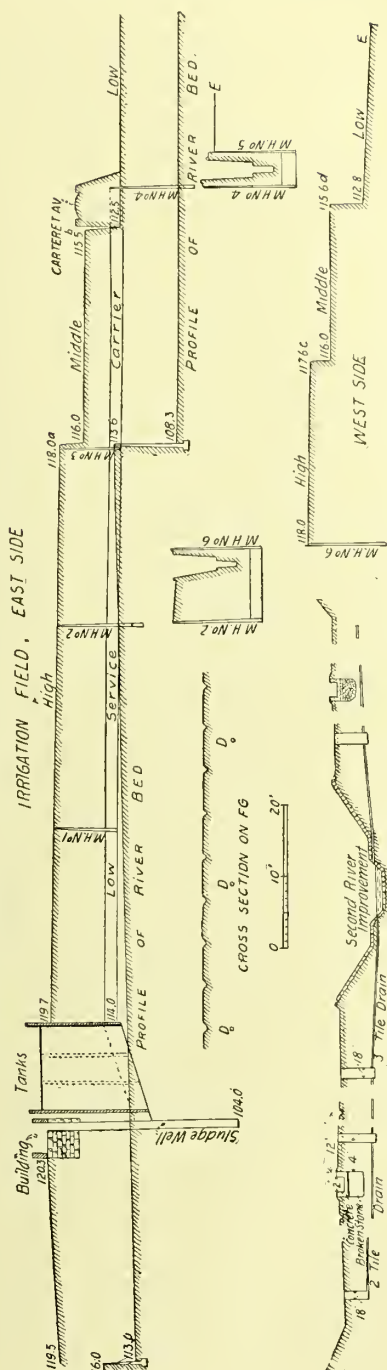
GENERAL PLAN OF EAST ORANGE SEWAGE DISPOSAL WORKS.
